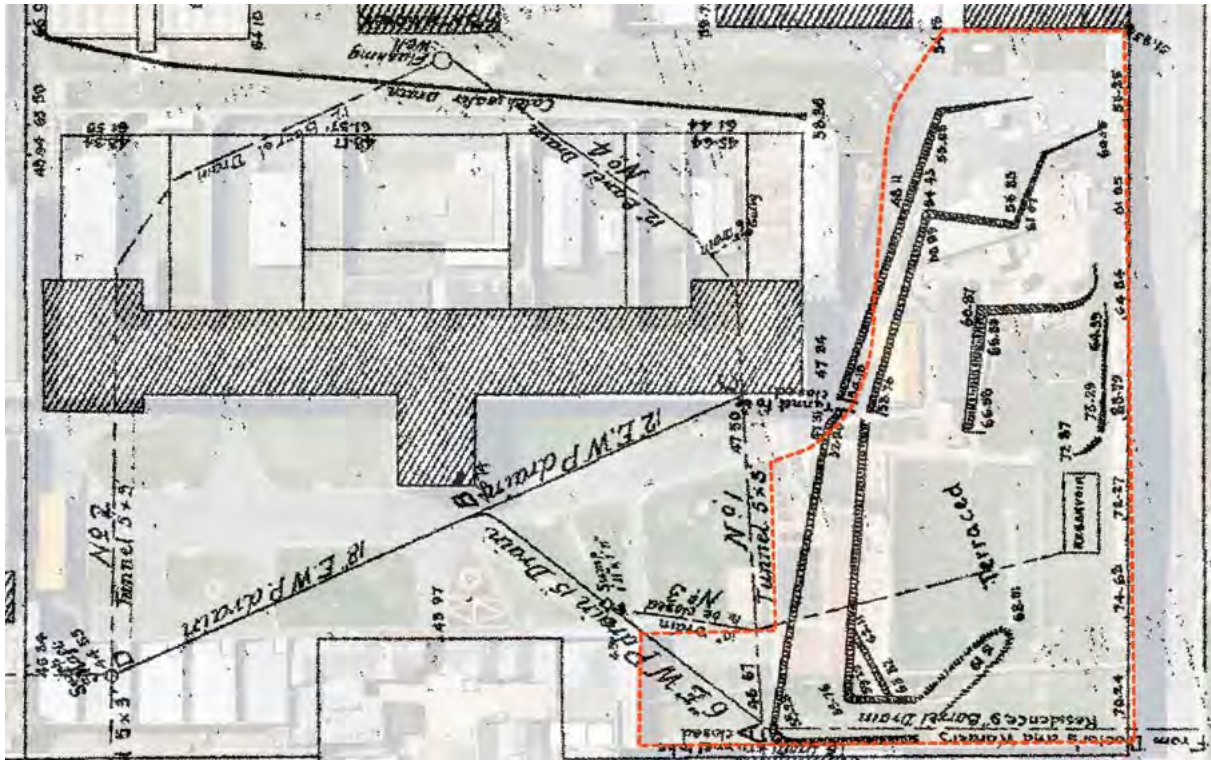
The 1897 site plan illustrating the large amount of terracing that occurred at around this time, probably requiring brick or stone retaining walls. Note the 'barrel drain' along the western edge of this zone. This will be a substantial construction, probably of locally-made brick.
